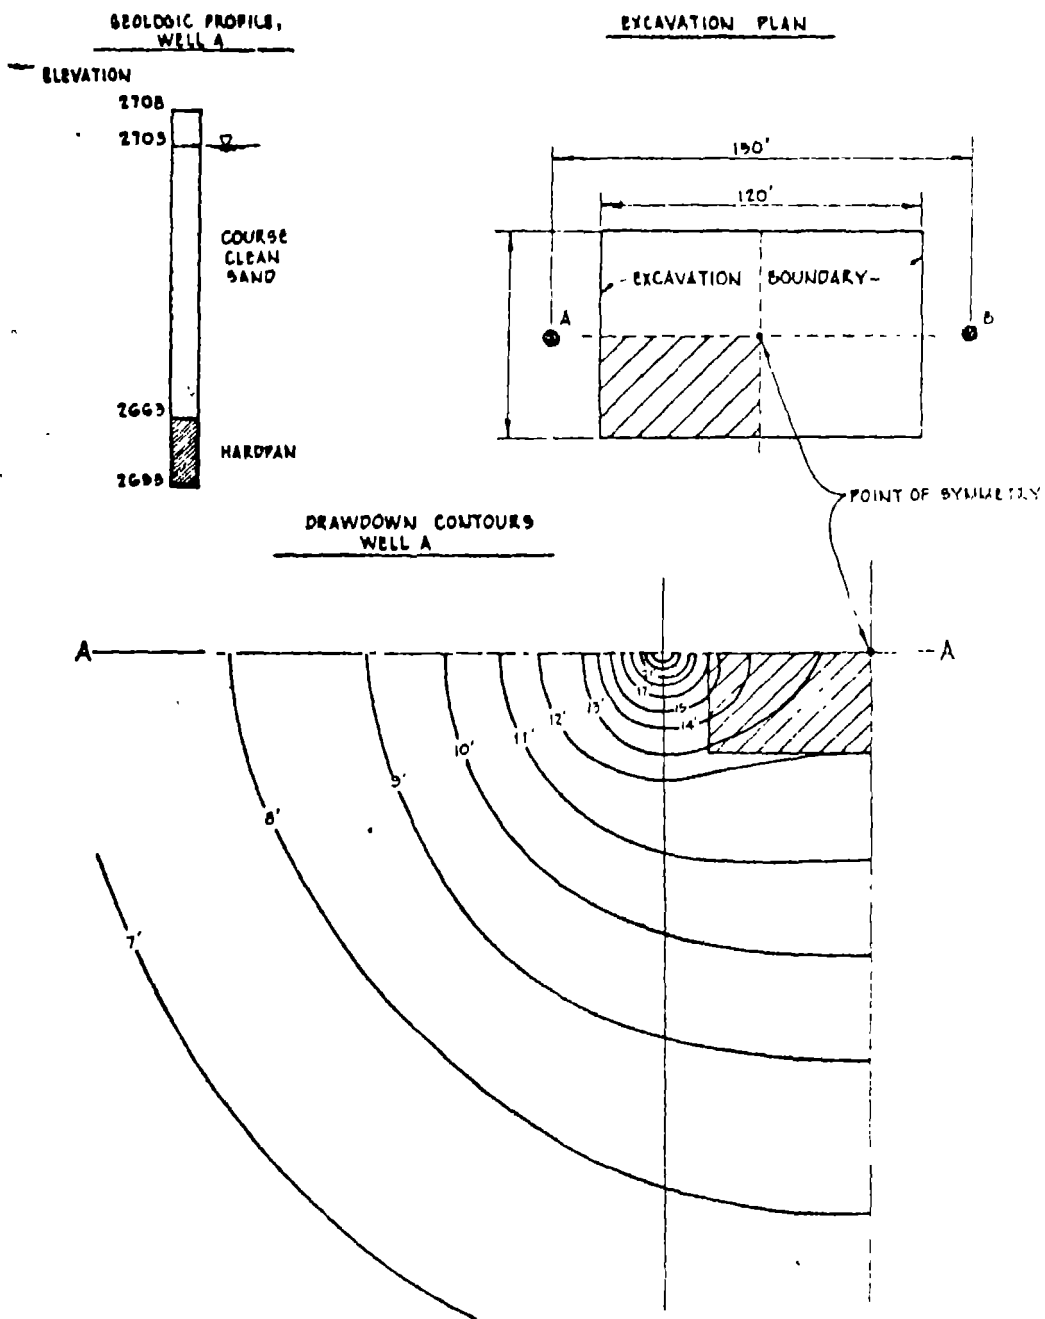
Plan view showing excavation boundary and well layout for dewatering. Drawdown water surface contours are shown for one quarter of the excavation area.
